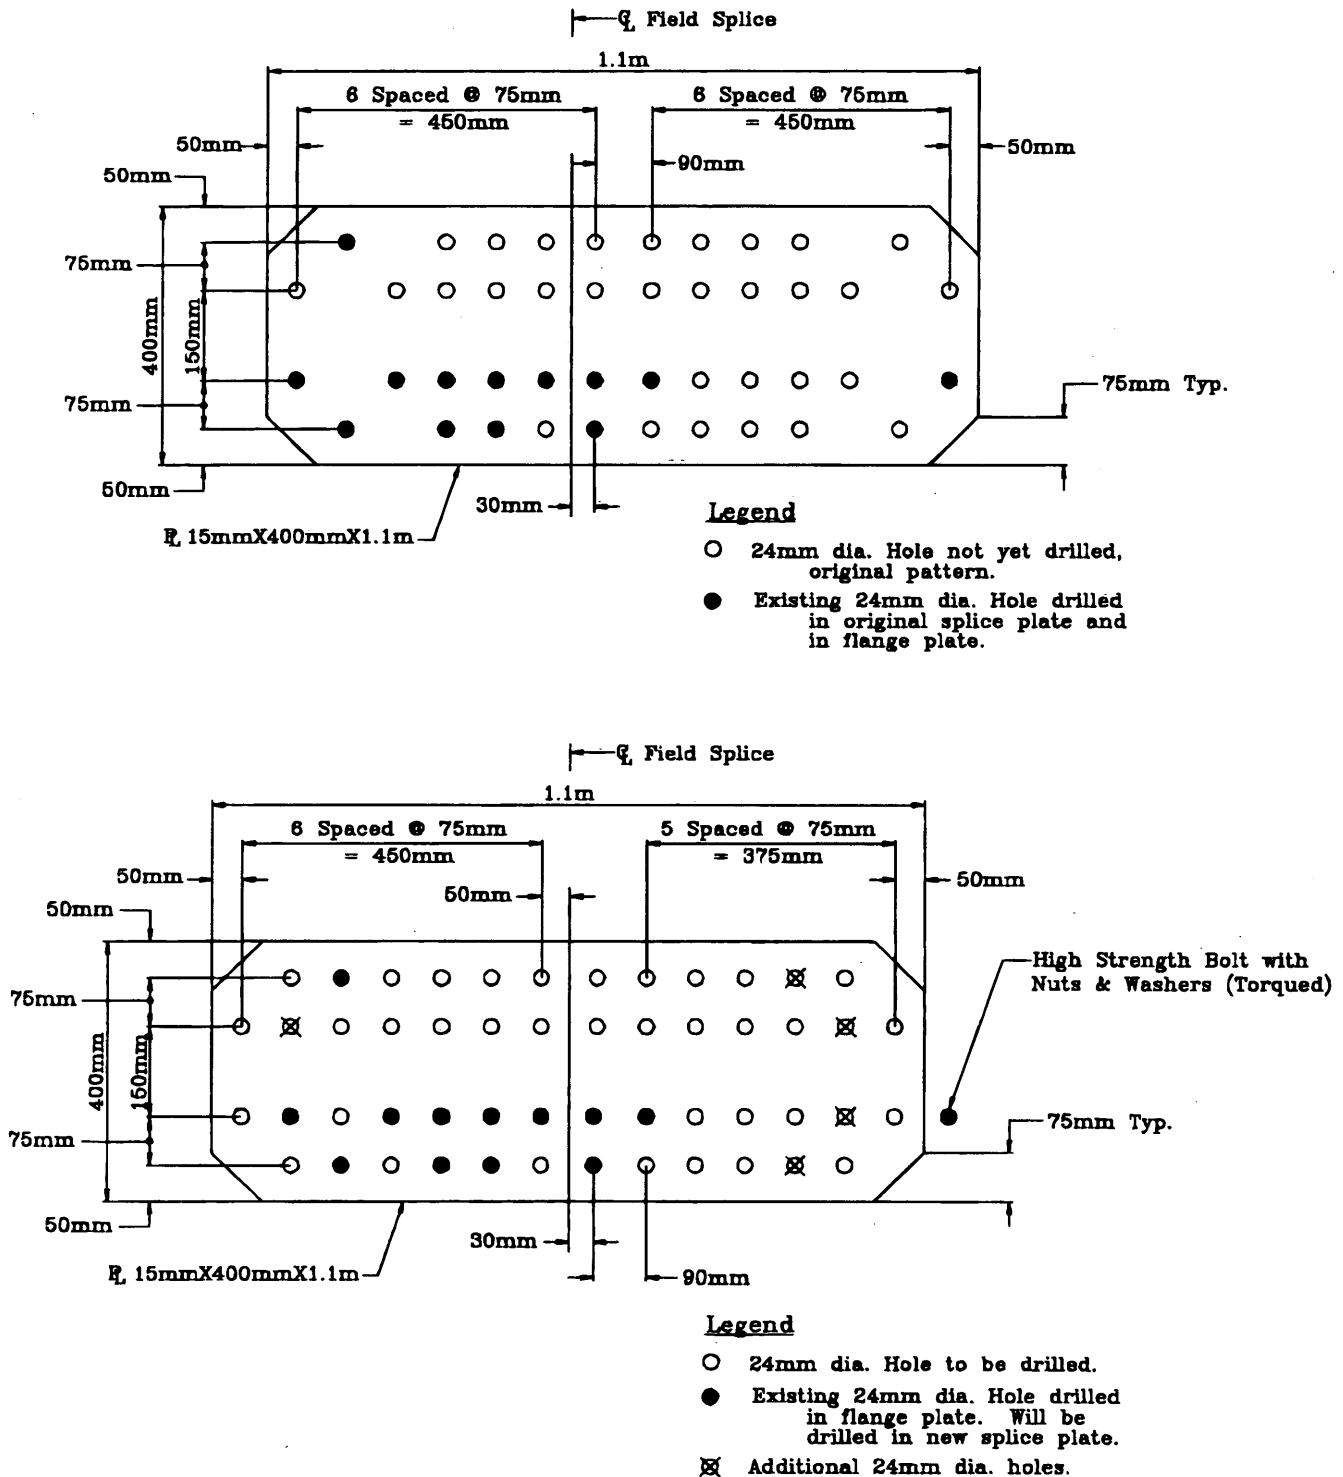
Operational example: mislocated holes at flange splice: top, misdrilled, bottom, modified (1 in. = 25 mm).
